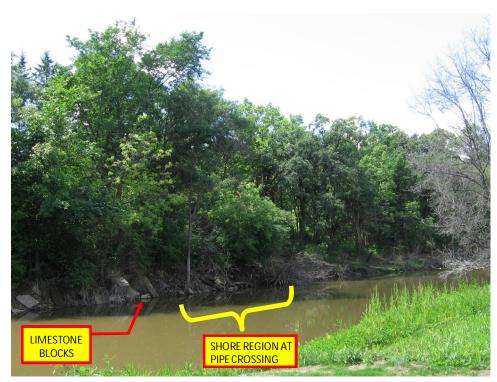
Steep south bank with sparse limestone blocks and rubble at river edge.
